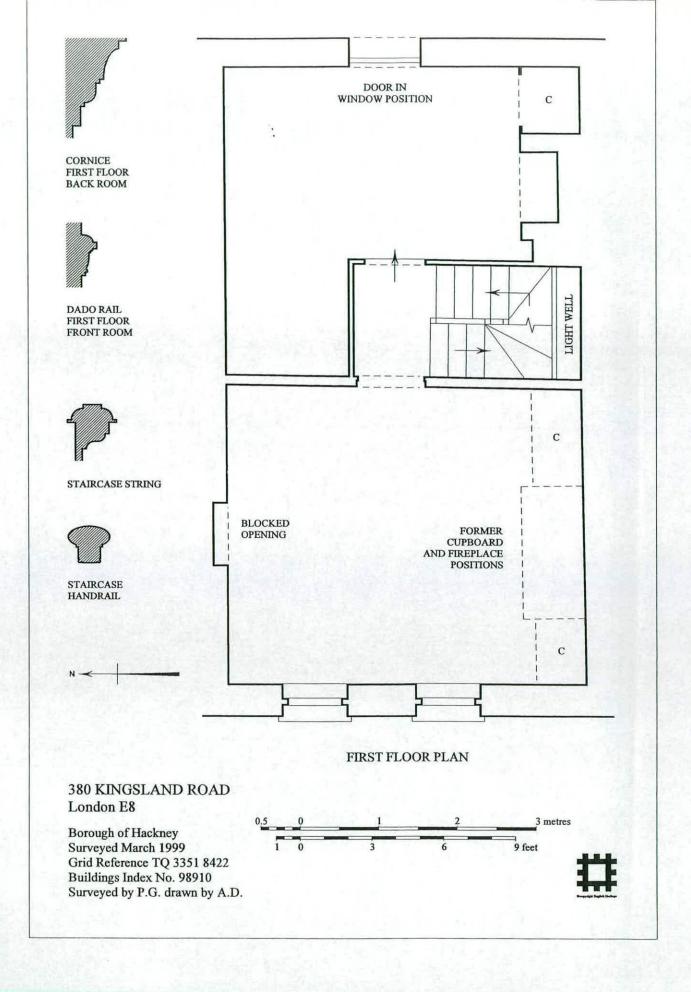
No. 380 Kingsland Road, first-floor plan and moulding details in 1999.
